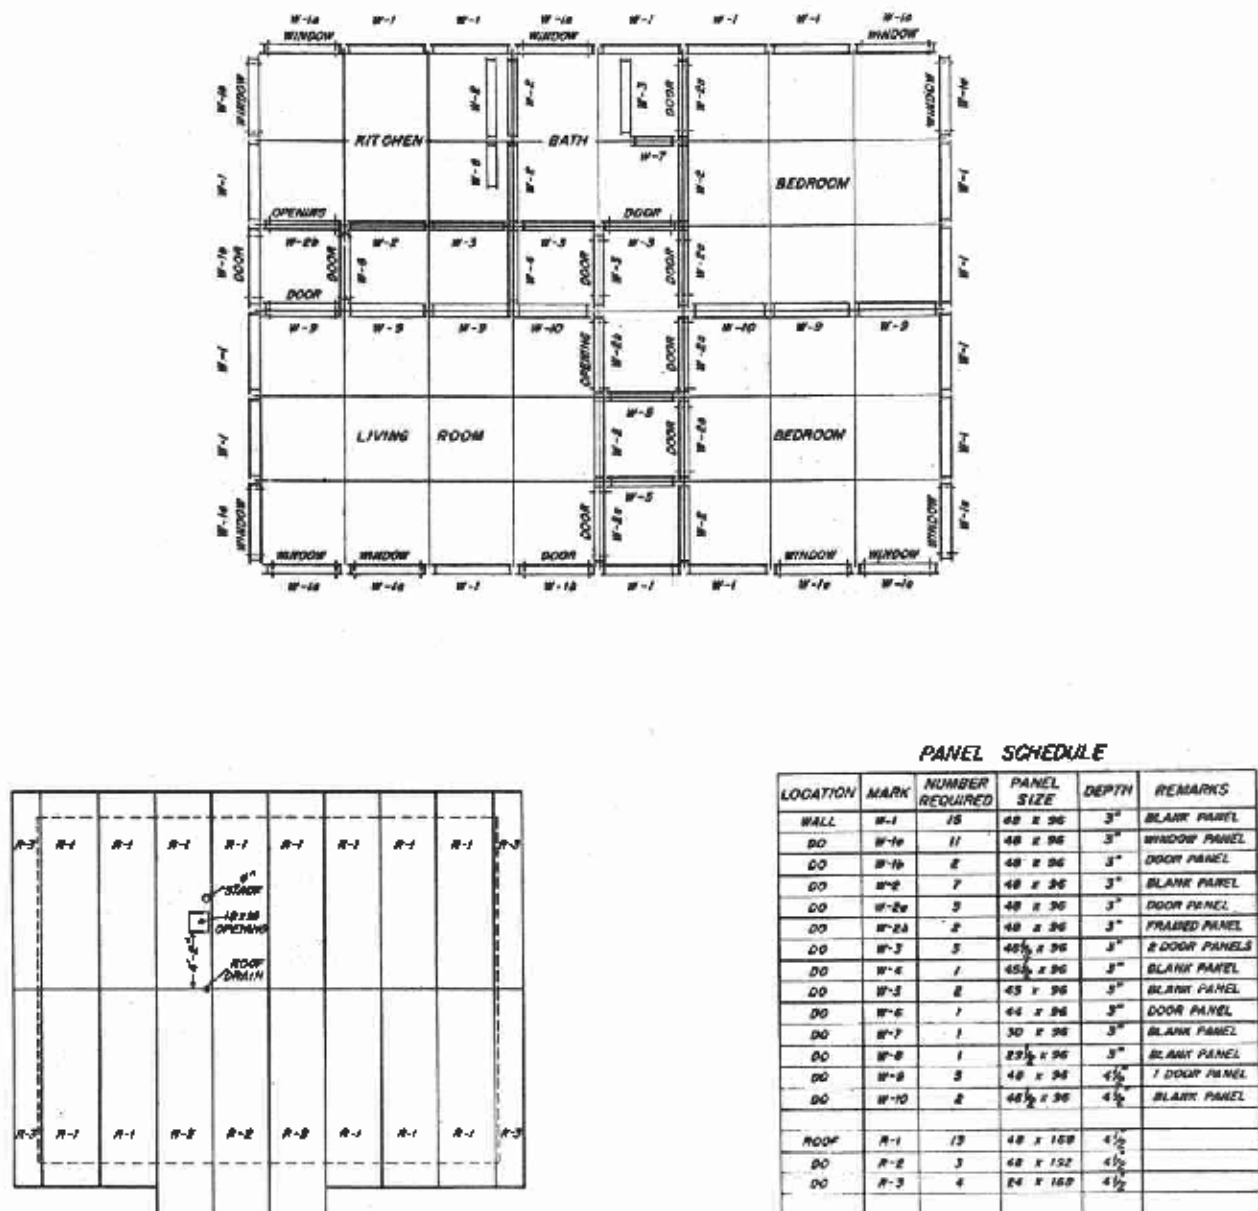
Panel schedule and assembly plan for walls and flat roof in a suggested design for a sandwich-panel house, based on a 4-foot module.
